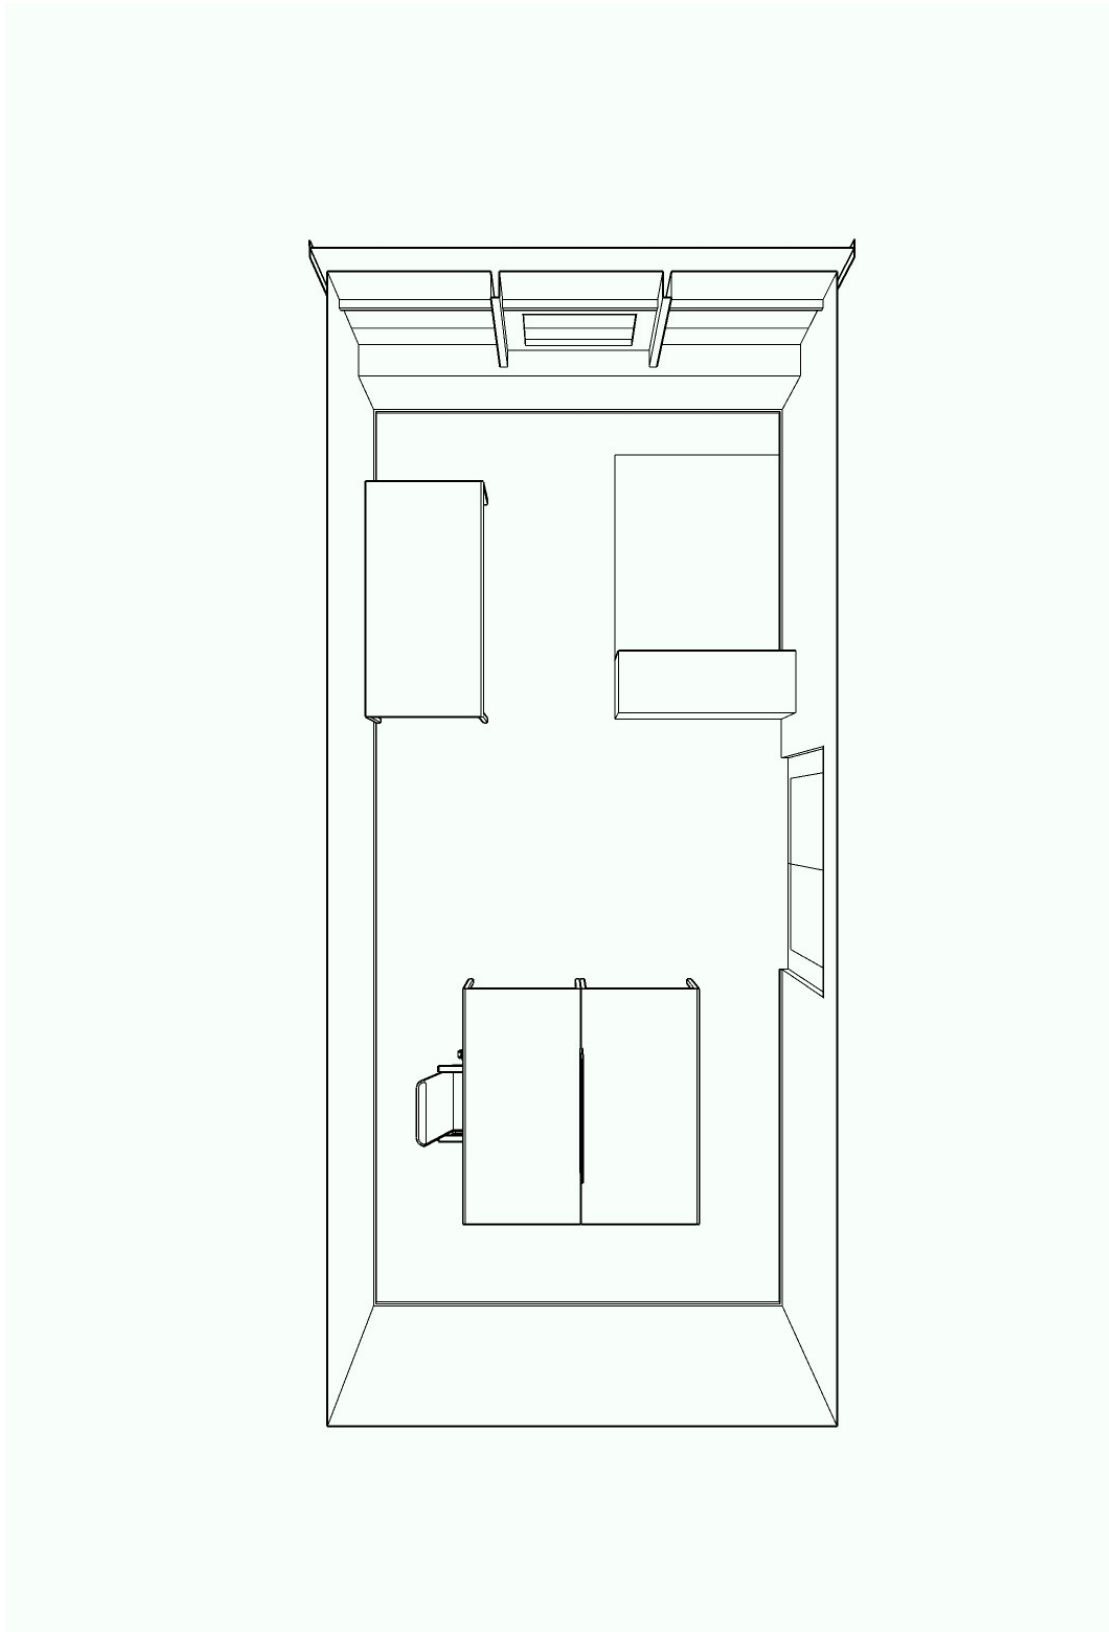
Floor plans of the daylighting test module (DEMONA)
